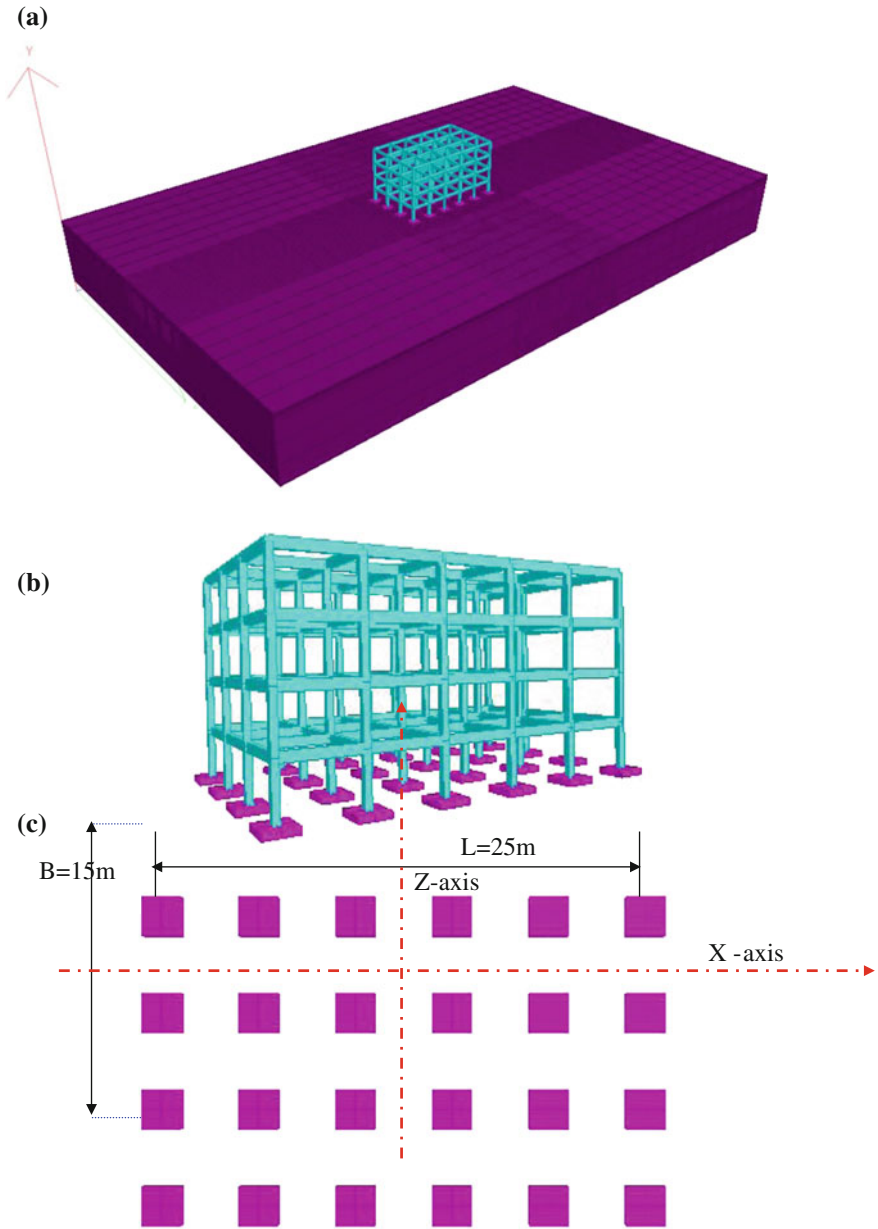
a Frame-isolated footing–soil system, b structure foundation system, c reference axis and arrangement of isolated footings [8]
